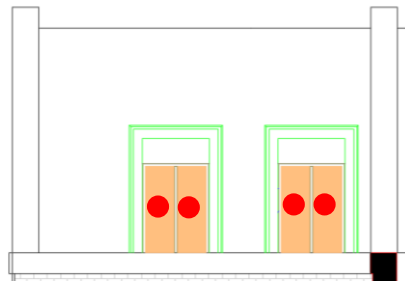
Apartment Type 1 North Facing Elevation: Location of Openings
